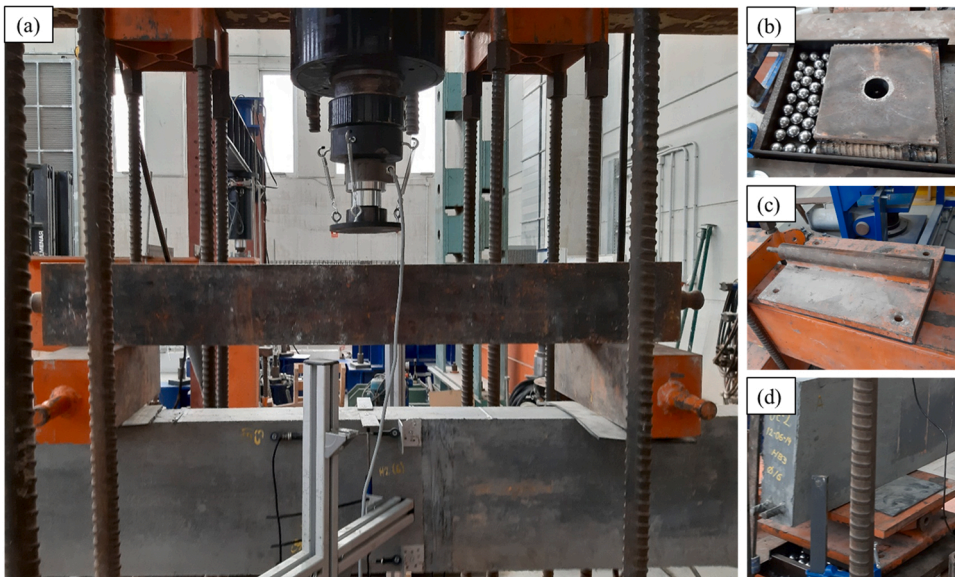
Testing frame details: (a) intermediate beam and loading plates, (b) sliding support, (c) fixed support and (d) hinged platform.
